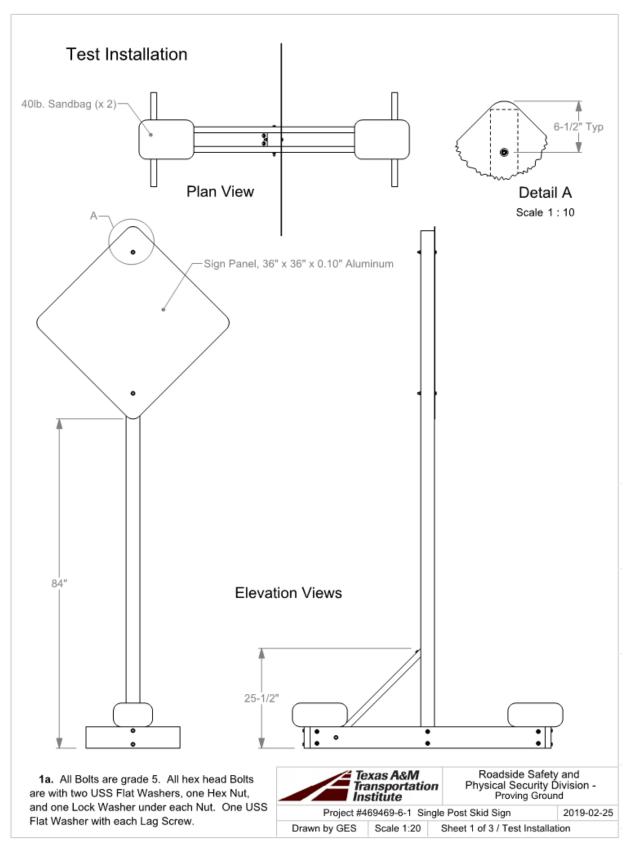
Overall Details of the Single Wood Post Skid-Mounted Sign.
